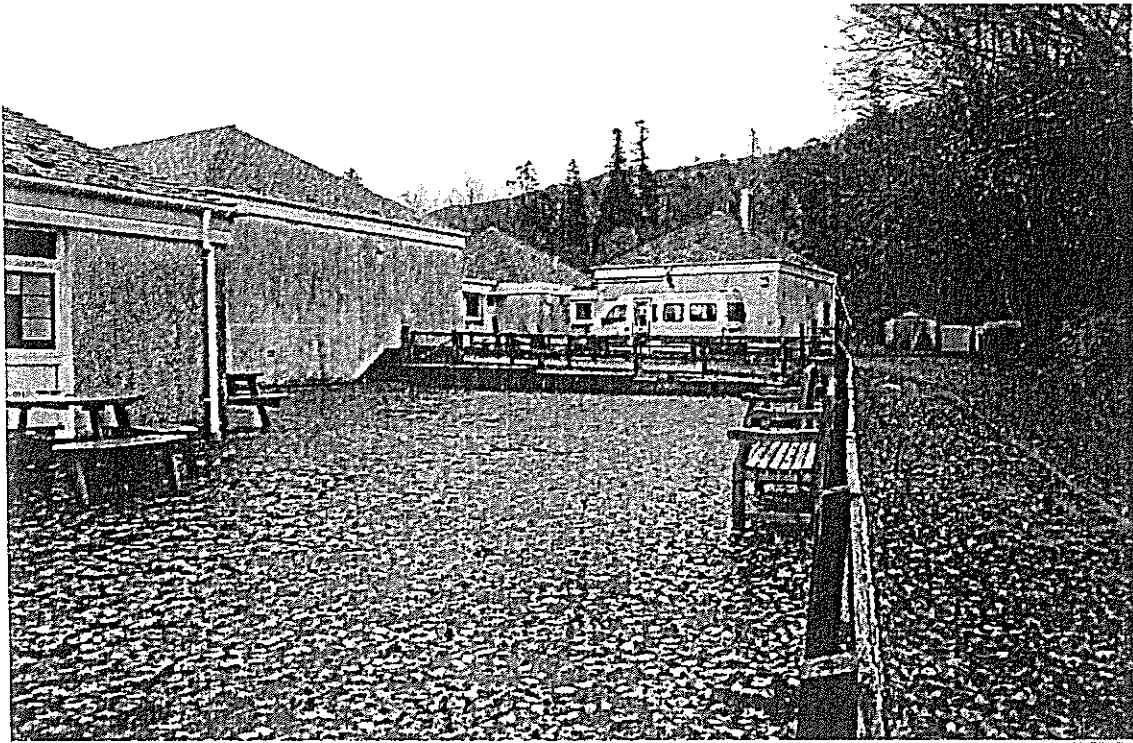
P4 to P4 playground from lower end. The retaining wall and fence which cuts the playground in half is visible. The access road to Dail Mhor house is also shown.
